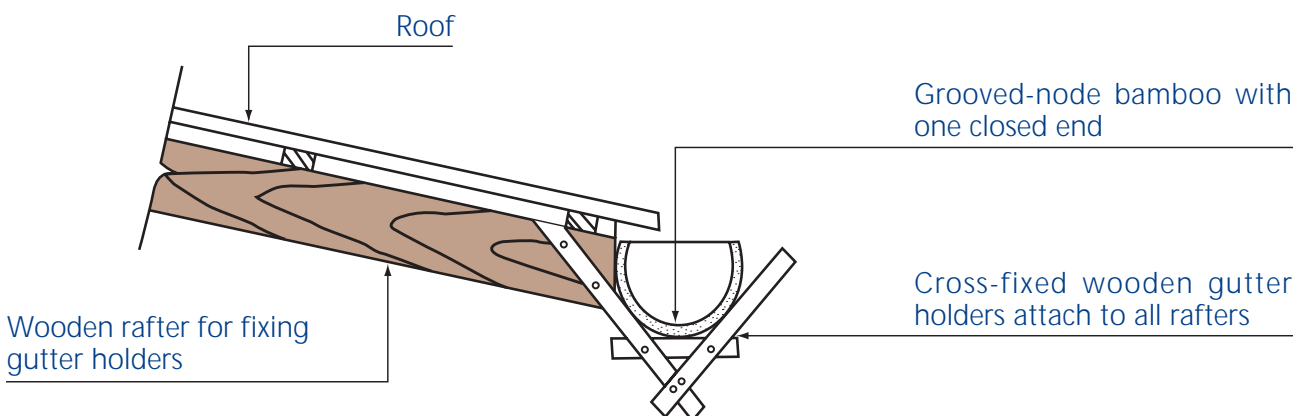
Fix the bamboo gutter to wooden roof structure using cross-fixed wooden gutter holders.
